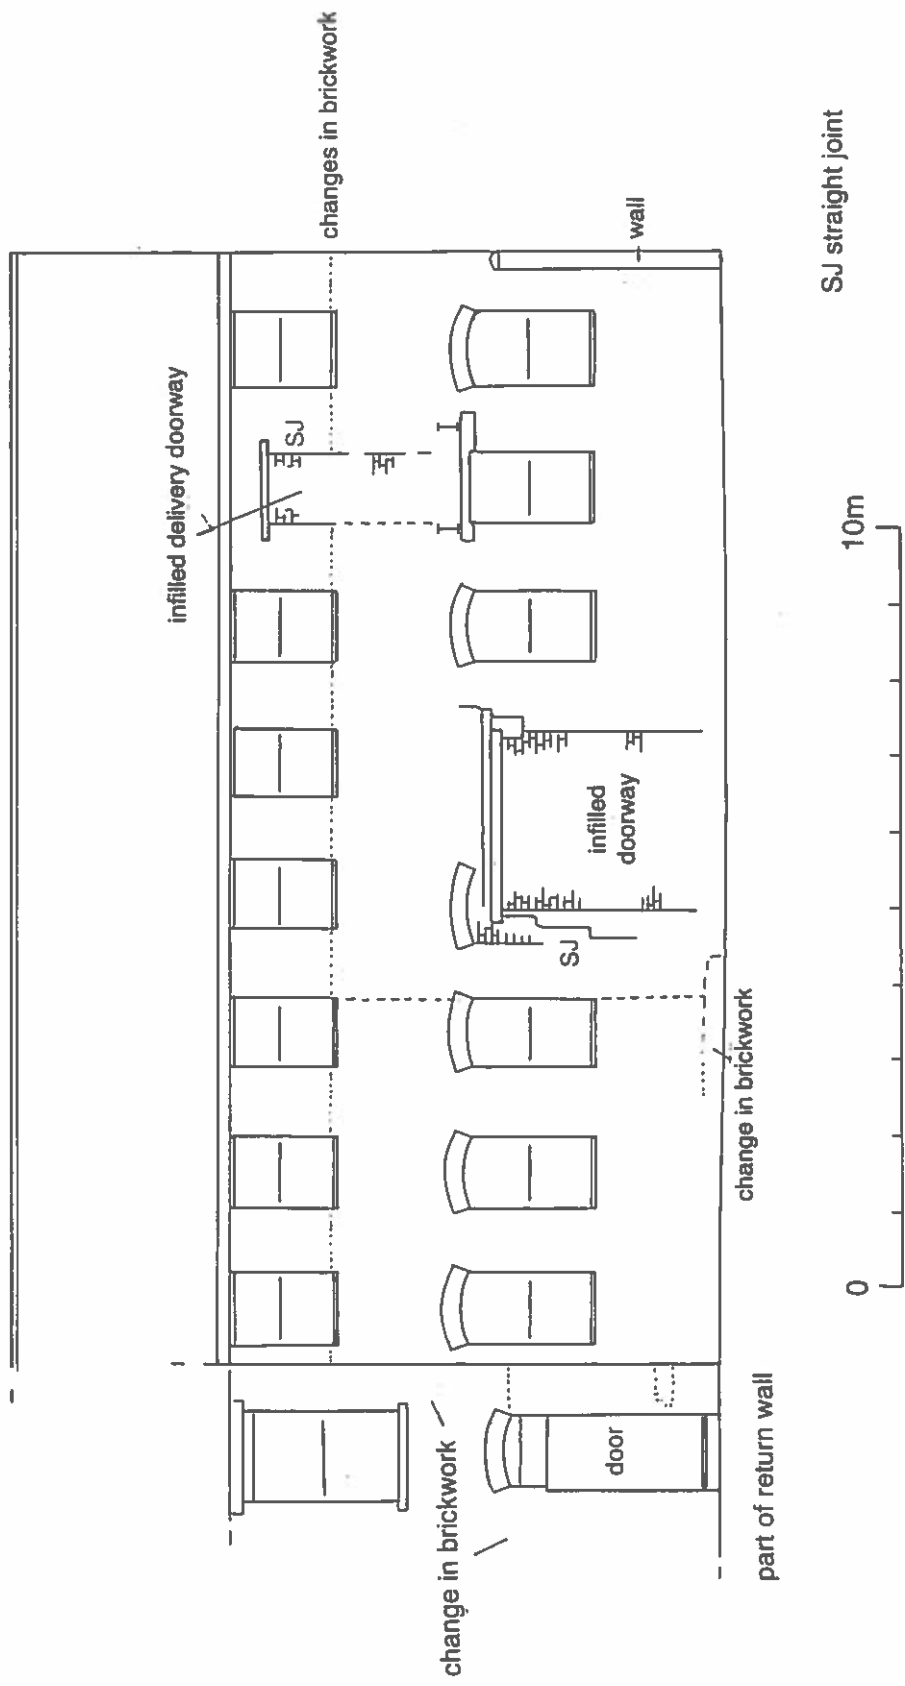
South elevation of the workshop (Unit 3). Scale 1:100.
